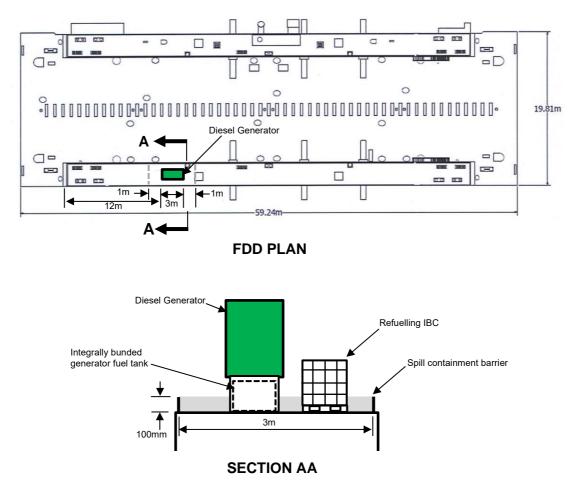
FDD Plan showing Wing Sections, Diesel Gen. Location & Fuel Spill Containment
